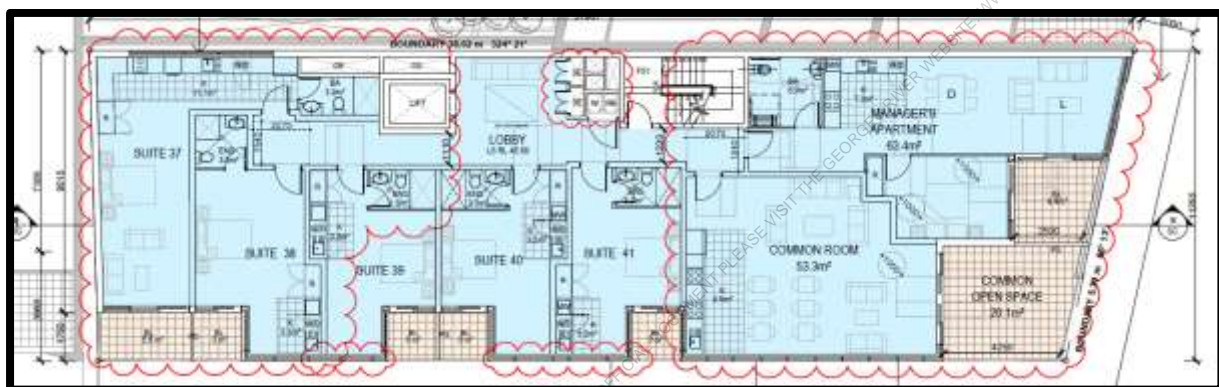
New amended Level 5 floor plan with common areas and manager's suite on the northern end.
